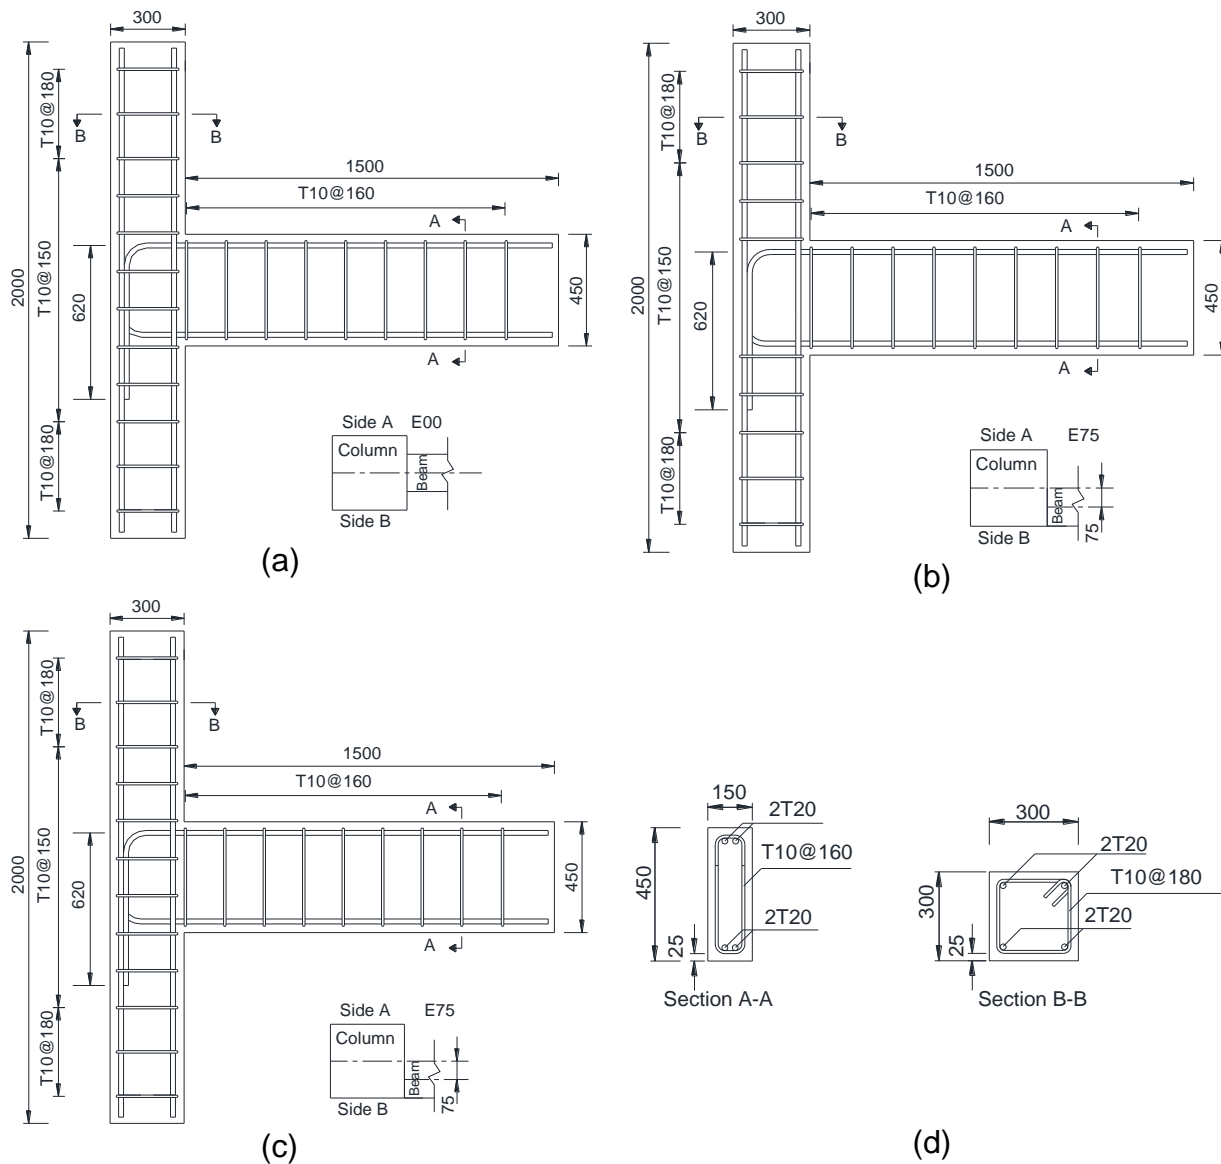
Details of specimens (dimensions in mm) (a) specimen JB-2T-E00, (b) JB-0T-E75, (c) JB-2T-E75, (d) reinforcement details of beams and columns
